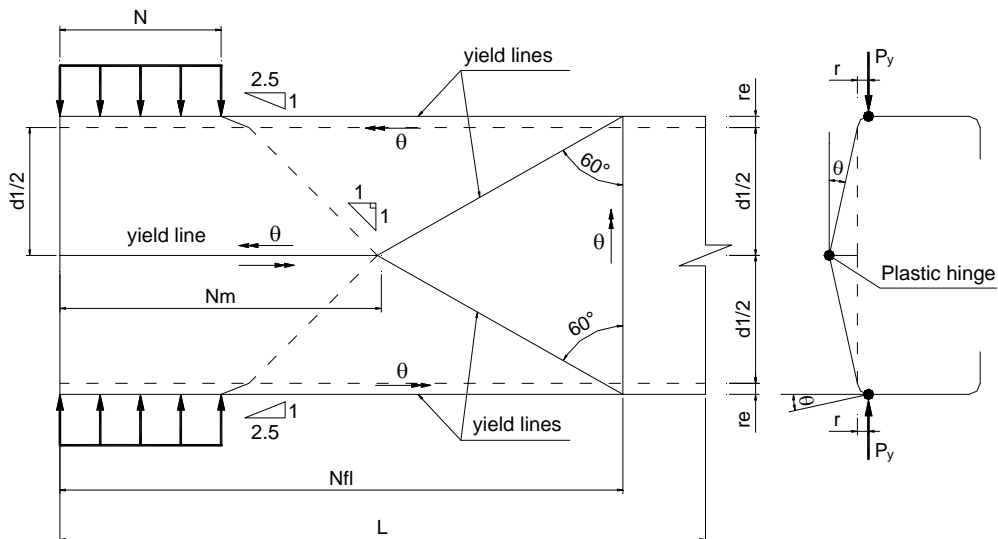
Yield-line mechanism for C-sections beams with fastened flanges [21]
